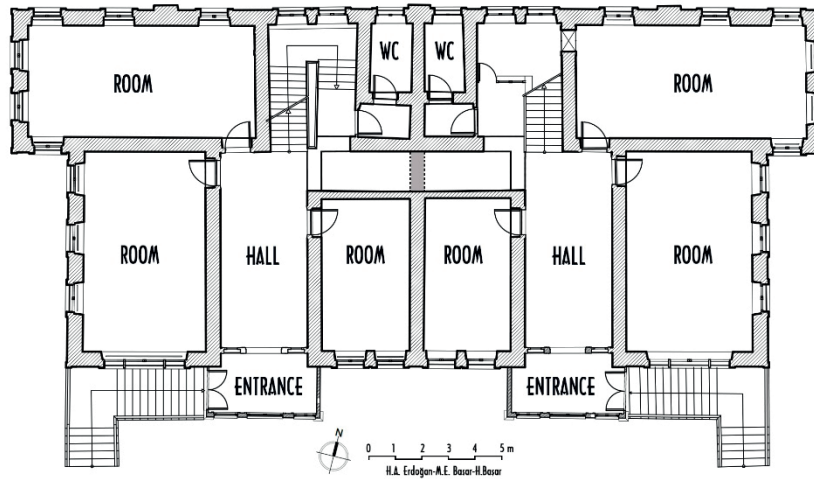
First Floor Plan of Girls' Secondary School (Hacı Abdullah Erdoğan, Mehmet Emin Başar, Hüseyin Başar Archive)
